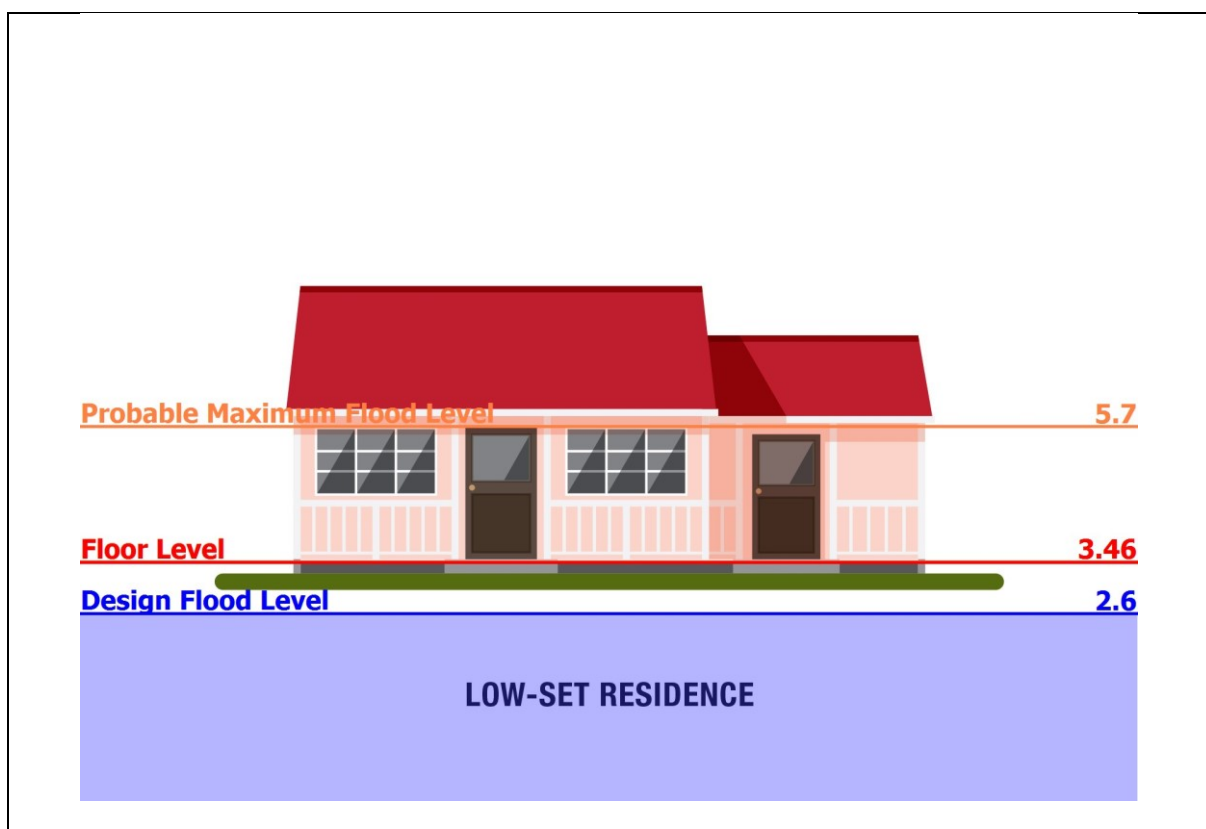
Flood and Floor Levels at 25-27 Boyd Street TWEED HEADS 2485
